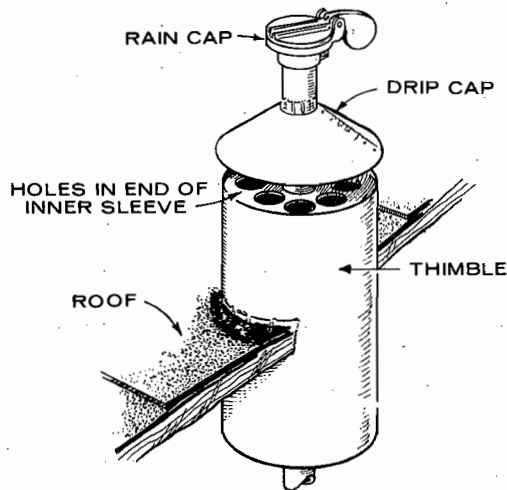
TYPICAL EXHAUST PIPE THIMBLE
